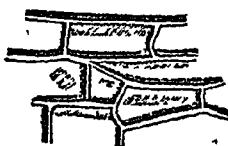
shows the elevation of a wall built of common rubble with the joints roughly filled in previous to pointing. Figure 87 shows the same wall after the pointing is finished.
